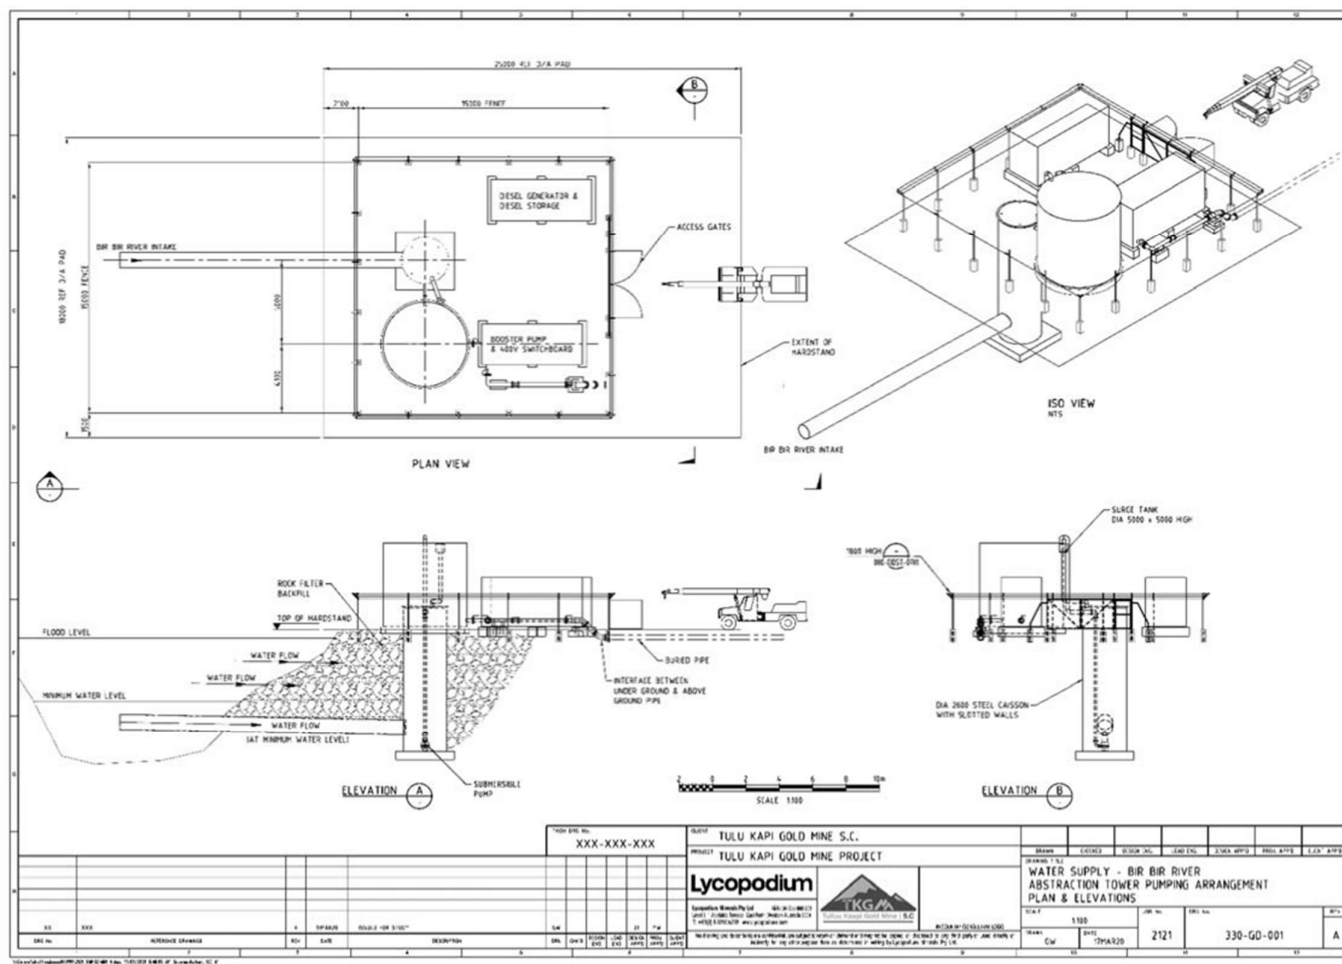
Proposed layout of the abstraction tower on the Birbir River
